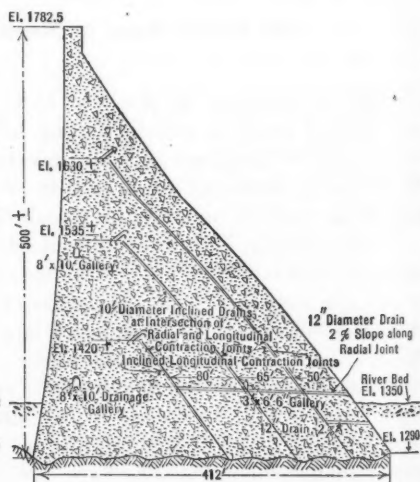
MAXIMUM SECTION, SAN GABRIEL DAM, SHOWING INCLINED JOINTS.
